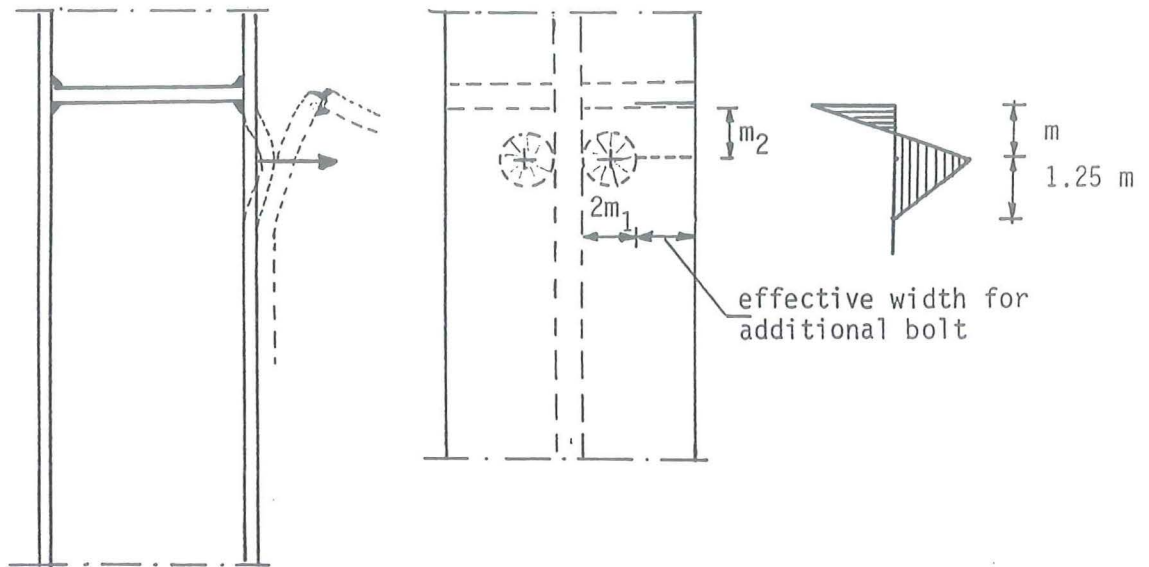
Effective length with assumed failure mechanism for an additional bolt adjacent to the stiffener
